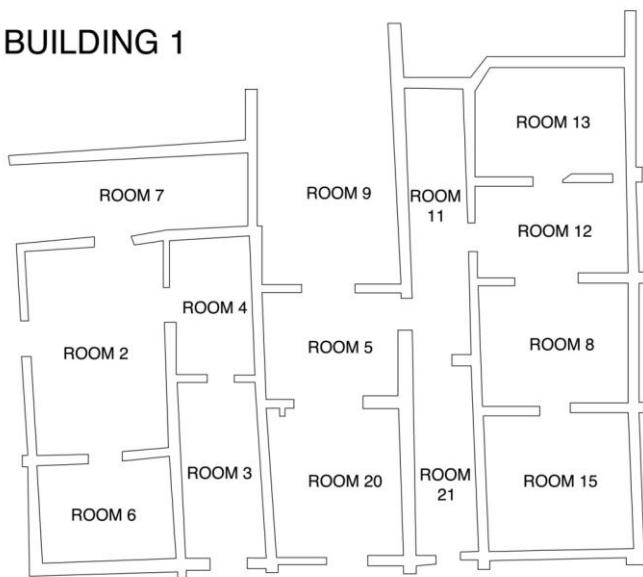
Plan of Building I at Tell es-Sawwan (adapted from Youkana 1997. Plan 4).
